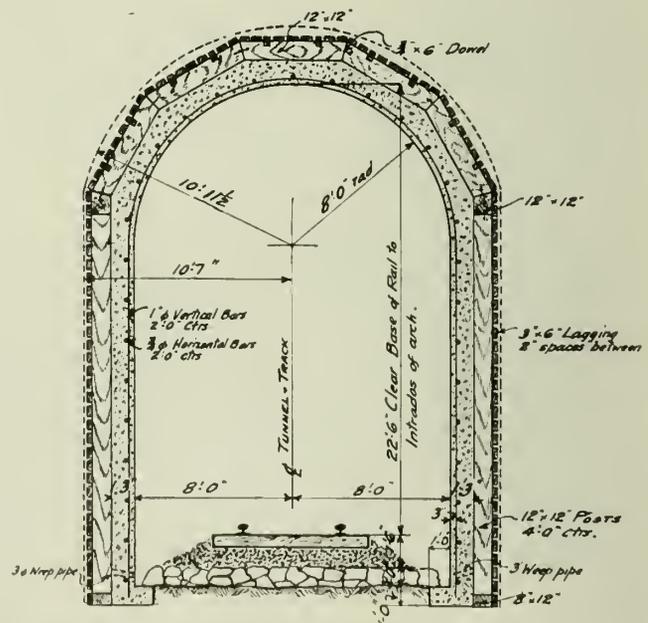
B—Typical Section in Loose Shale Where Timbering is Required.
